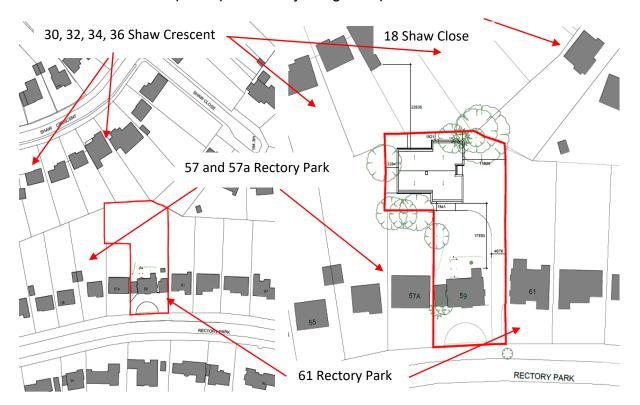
Existing Site Plan (left) and Proposed Block Plan (right)
